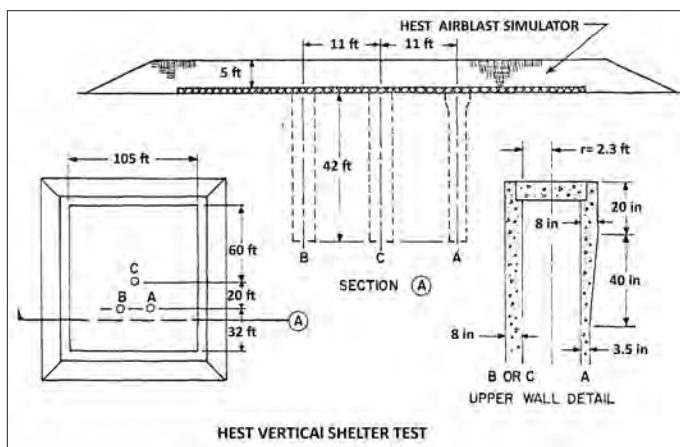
Phase III Vertical Shelter Test (HEST) 1/3 Scale. Three similar models were tested, two designed to respond without significant damage (B and C) and one (A) designed to have major longitudinal compression damage in the launch tube wall. The test was extremely successful and proved not only the value of the mathematical model but also the value of subscale testing.
